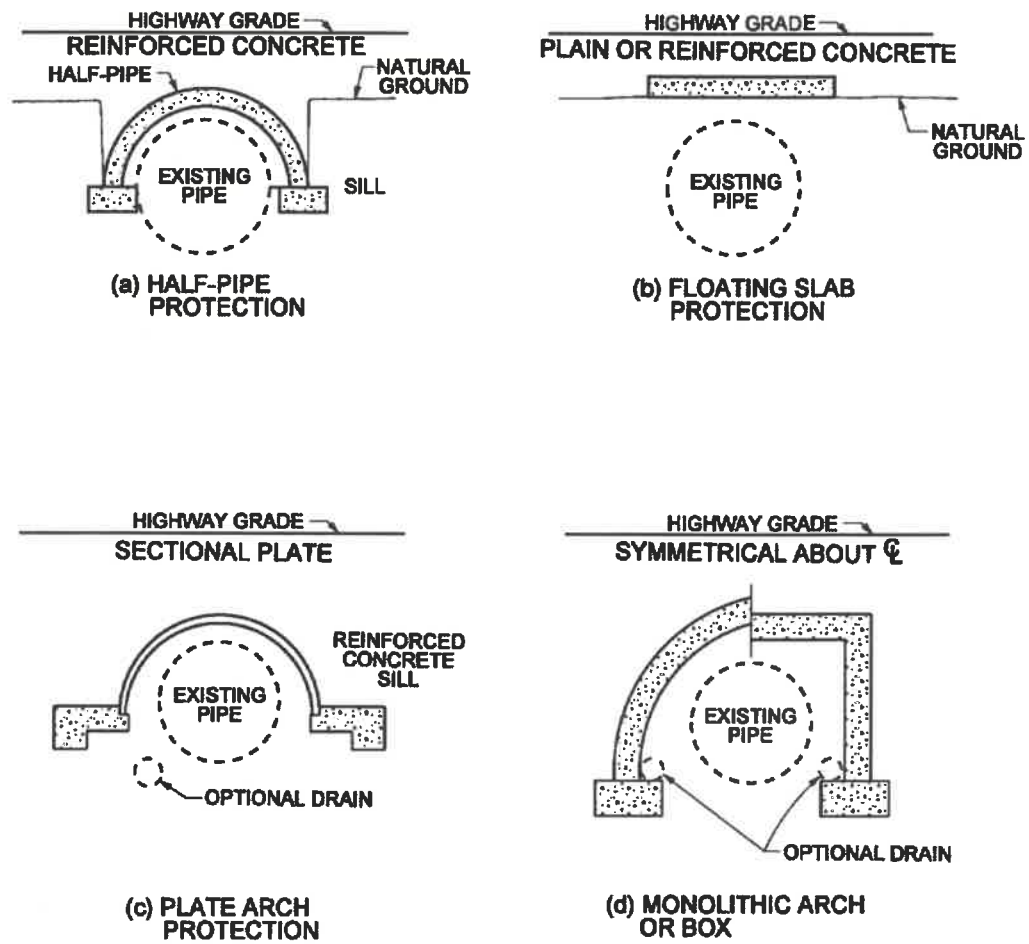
Examples of Encasement and Allied Mechanical Protection
